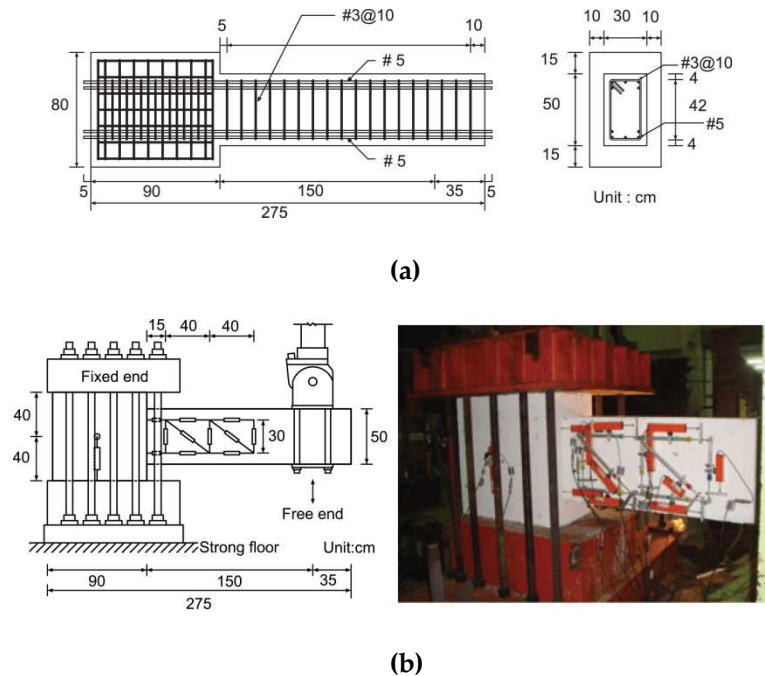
Experimental test Specimens (Ou et al. 2012): (a) dimensions and reinforcement details (b) test setup
